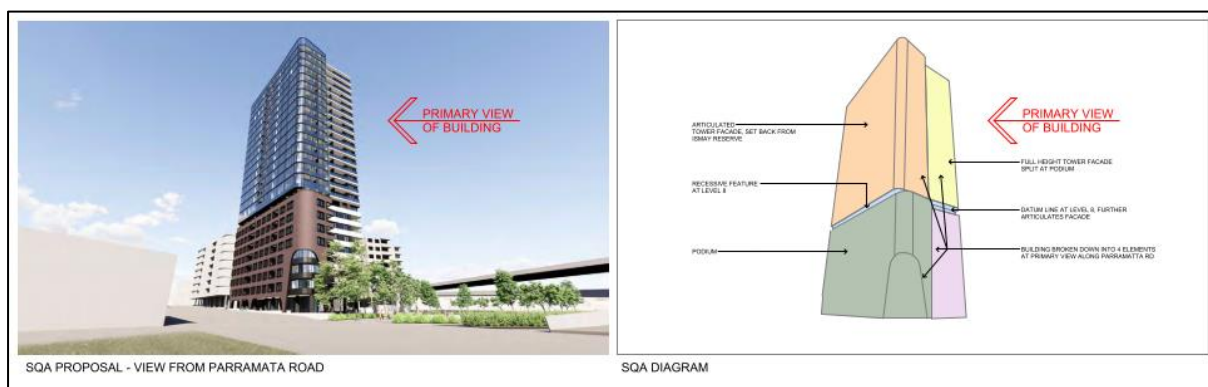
3D Modelling Analysis showing proposed built form facing north-west
